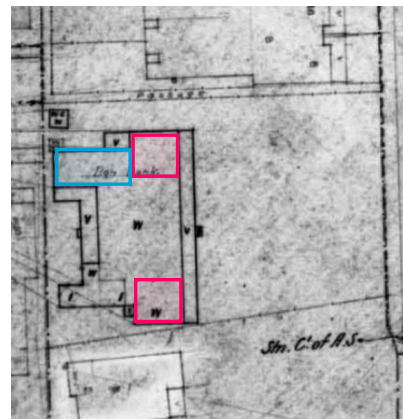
Water Board Plan 1892 (rooms assumed added c1856 outlined in red, kitchen/bathroom wing in blue)
